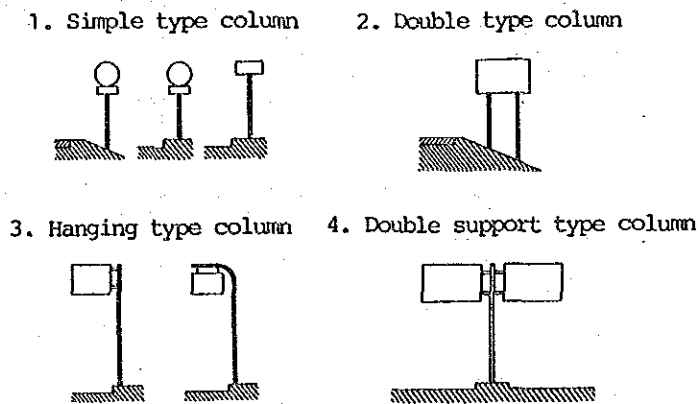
INSTALLATION METHODS OF TRAFFIC SIGN
